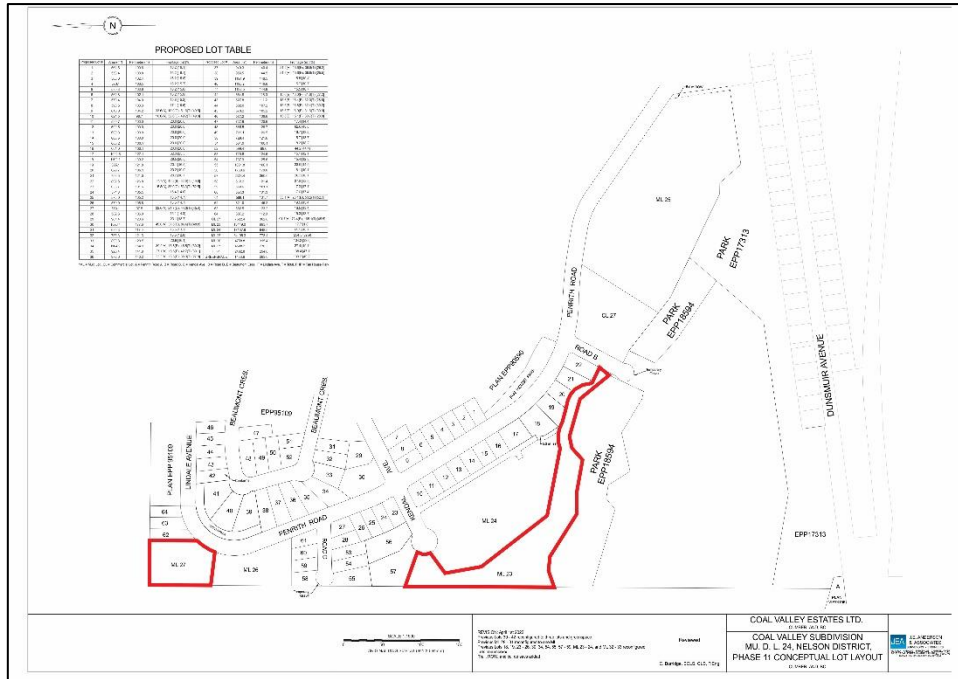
, Site plan as of October 4, 2022 showing lot configuration. ML23 and ML27 are proposed to be gifted to the Village and are outlined in red.
